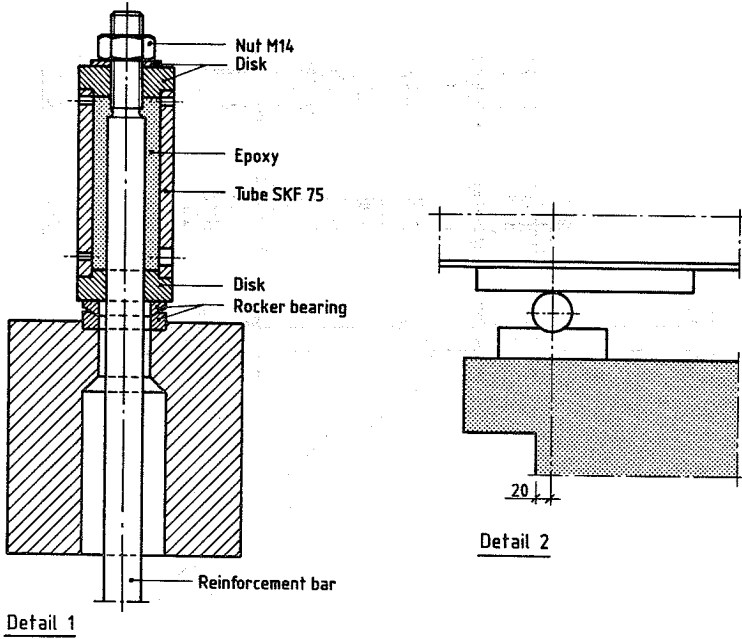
Anchorage detail and bearings used for the S.B.-tests.
